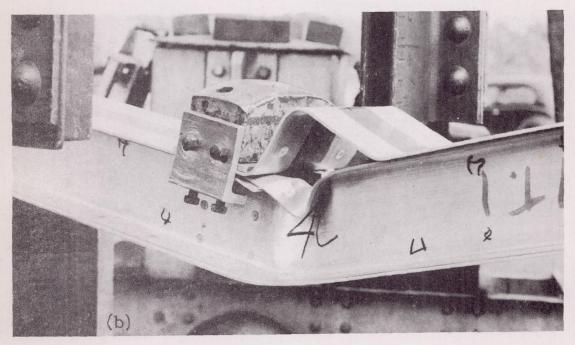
,b. - Beam fatigue tests of spot-welded and riveted girders.
